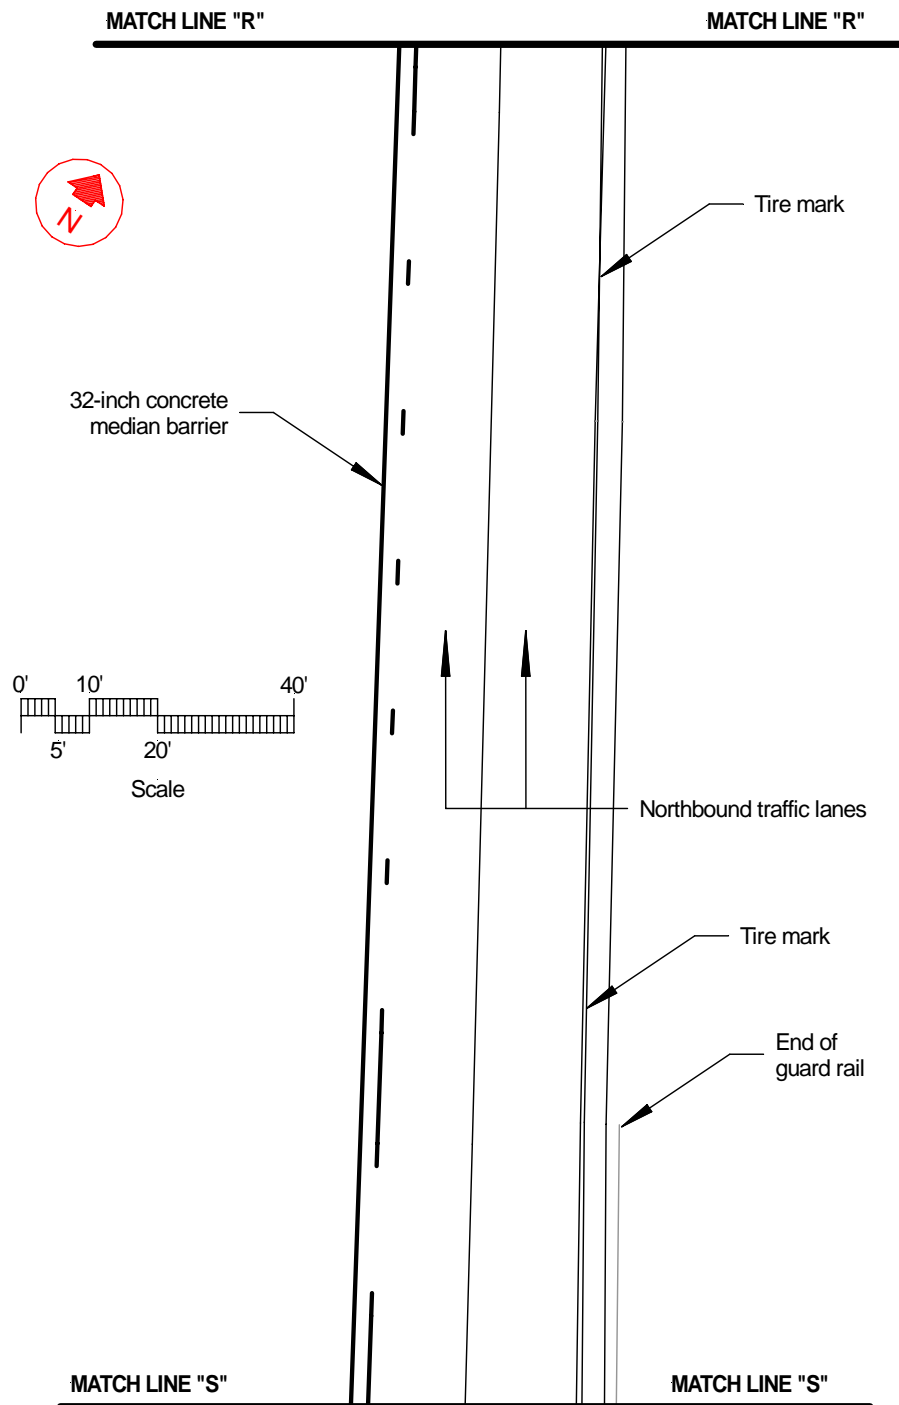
NTSB map of R-S pavement markings and roadway evidence.
